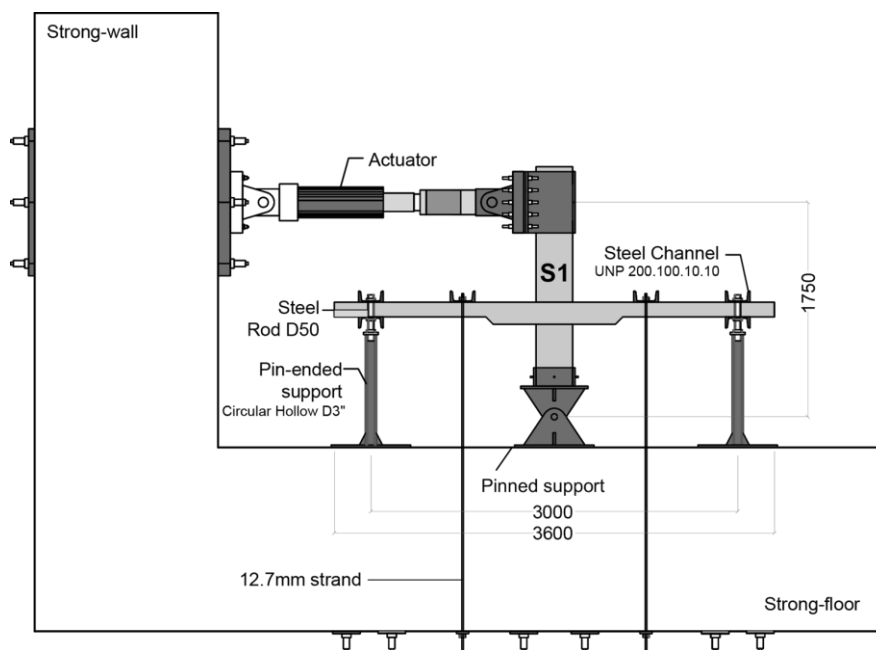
Testing configuration of slab-column connection (unit in millimetre).
